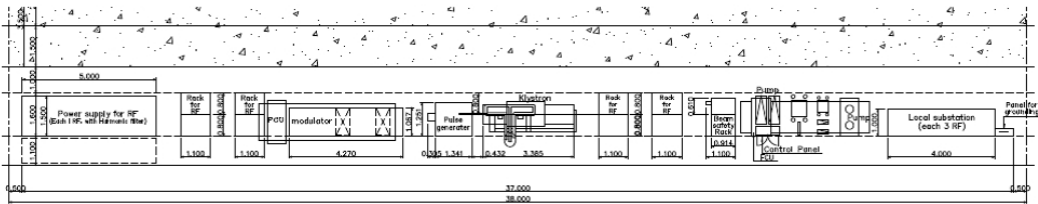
Partial plan view of ML tunnel service section for Japan site
